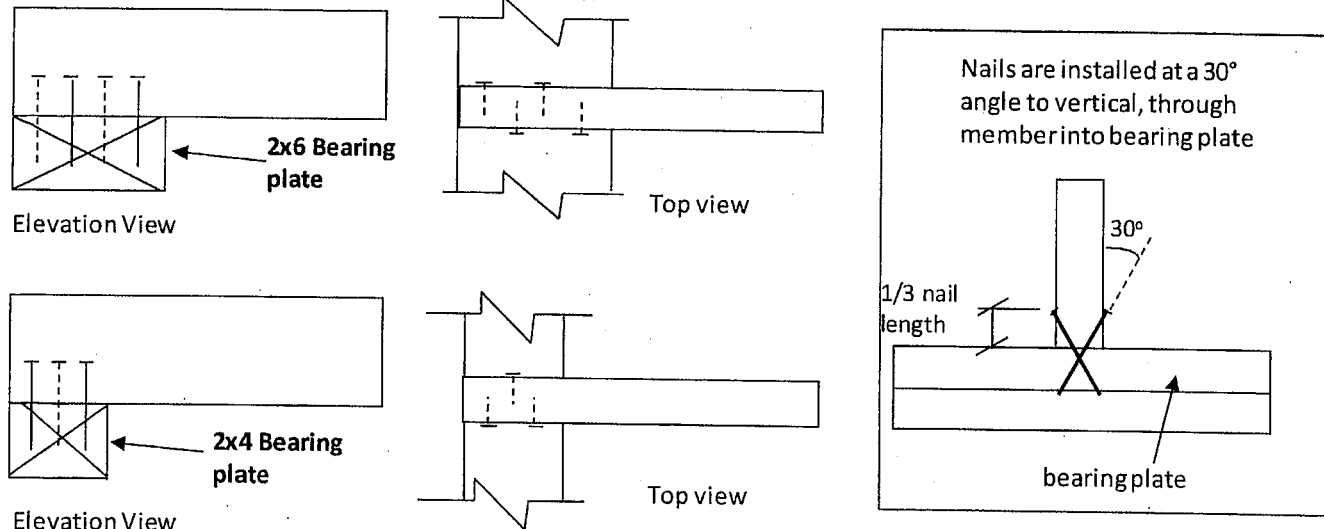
Toe-Nailing Rafter / Ceiling Member to Girder Truss
